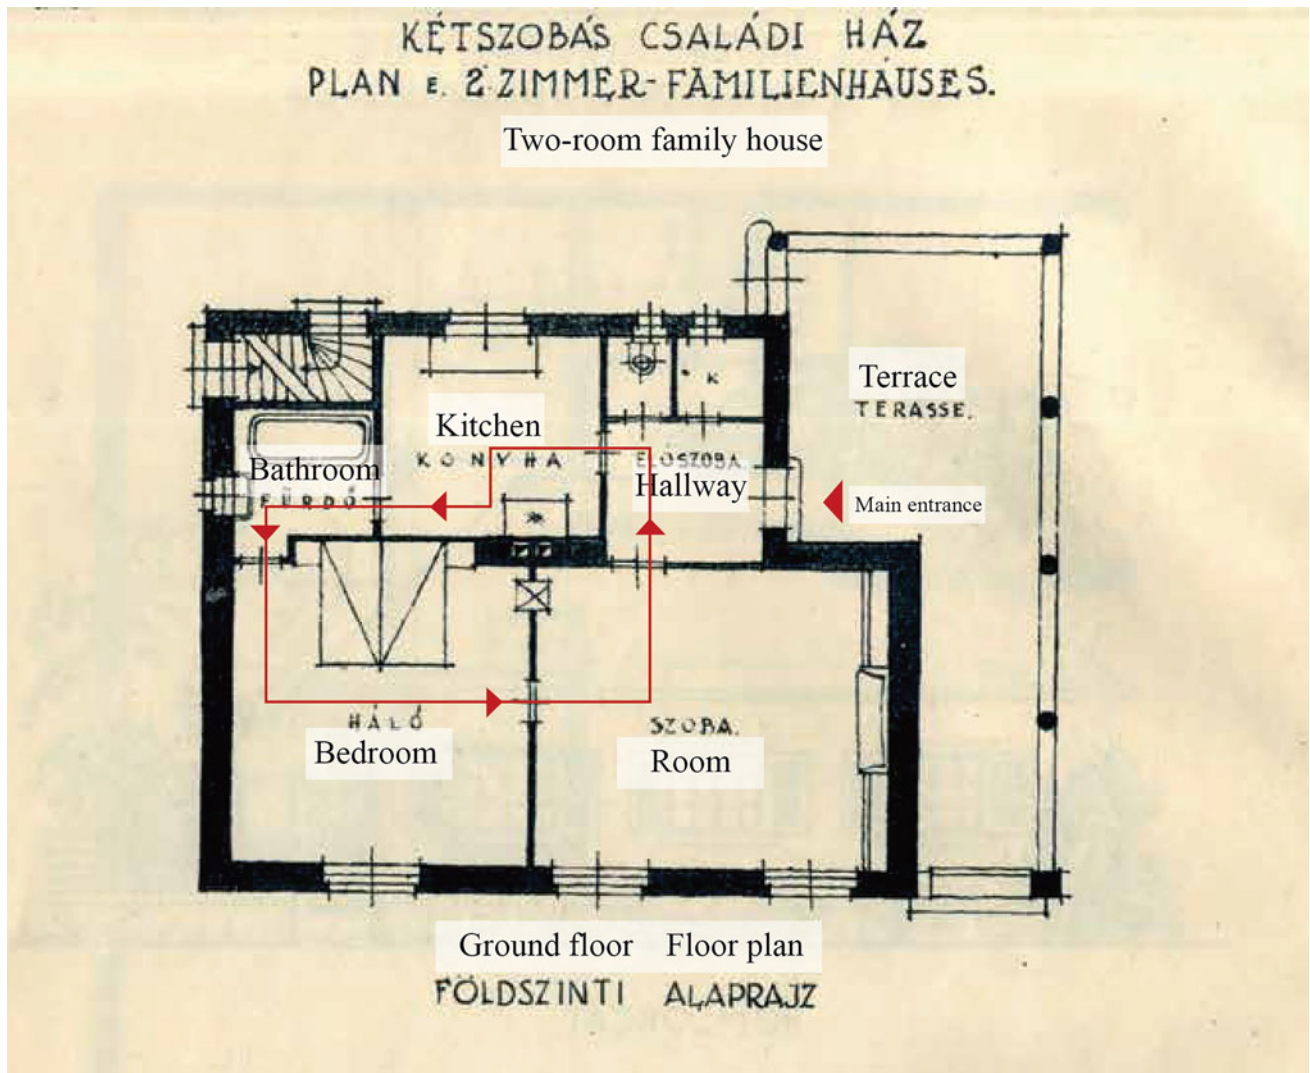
(Left) Ground floor plan of a cube house (Weichinger Károly, 1928)
